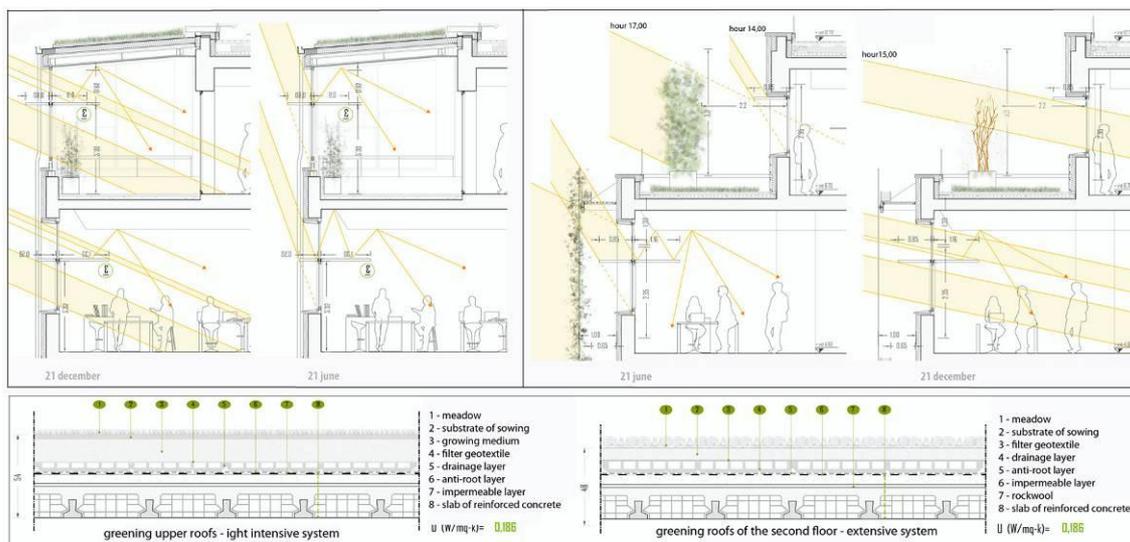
Design solution of the S-SW (left) and W-NW facades (right) and constructive details of green roofs, building Polo Pindaro, Pescara
